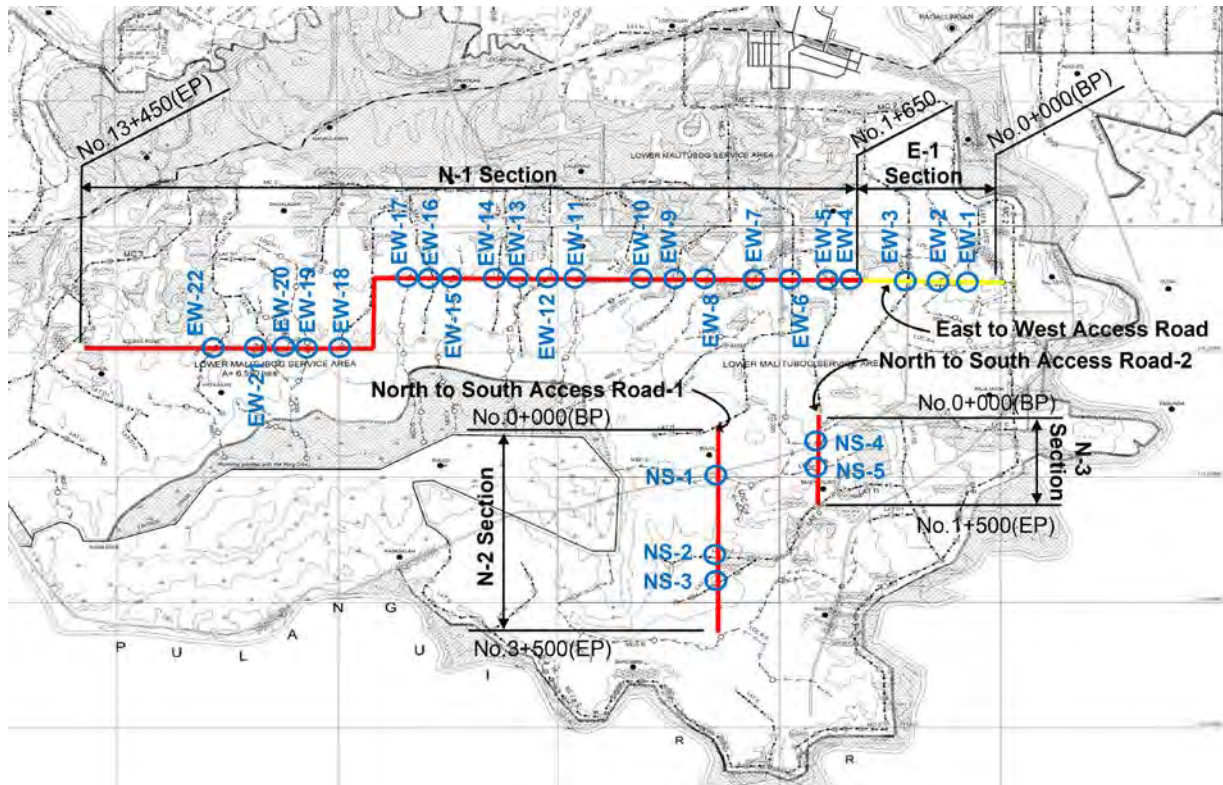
Location Map of Access roads and Bridges (Construction Plan of Case-2)
